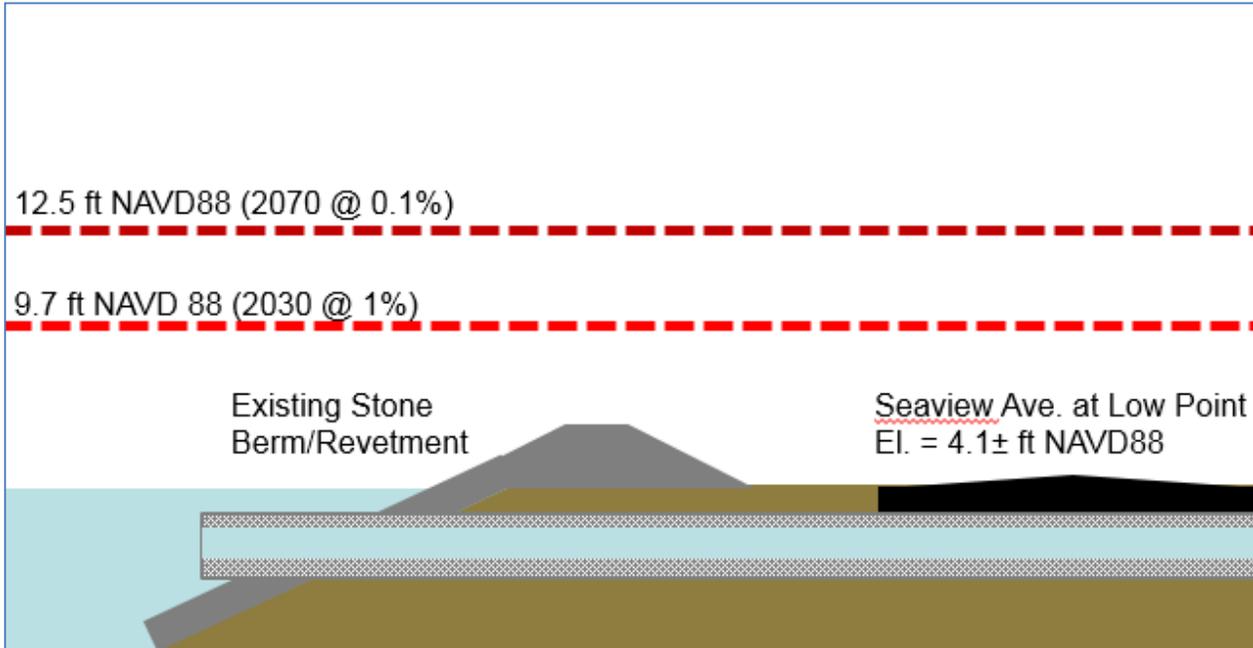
Seaview Avenue at Farm Pond – Existing Conditions
